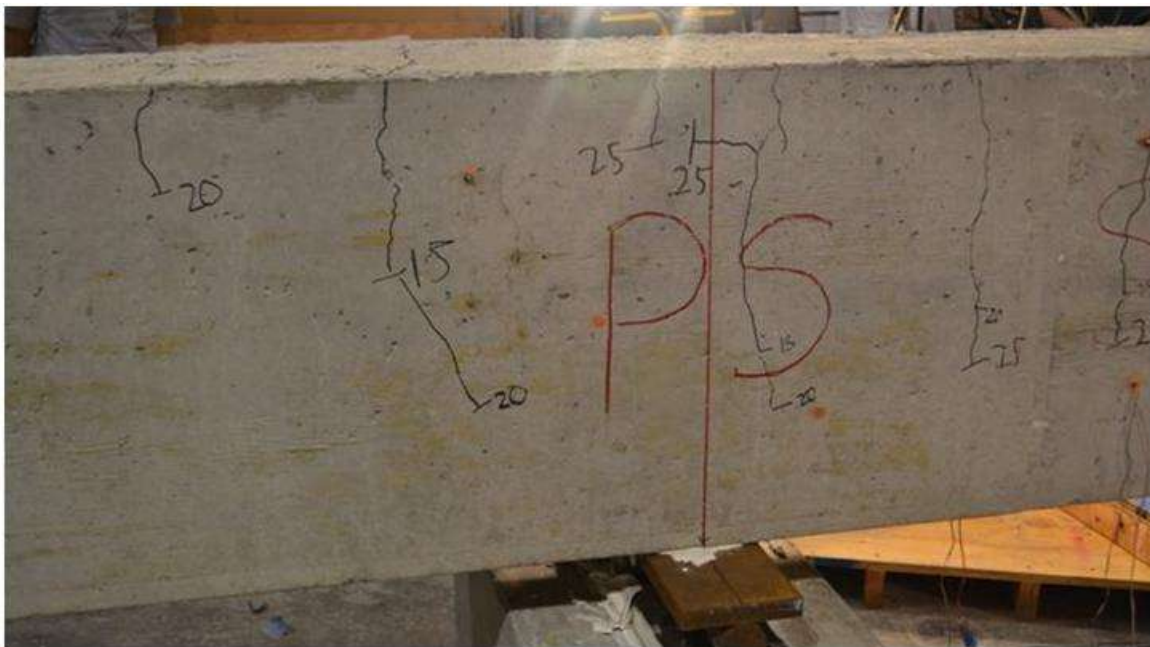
Beam 1, north side of east support with horizontal crack, 25 kip end load.
